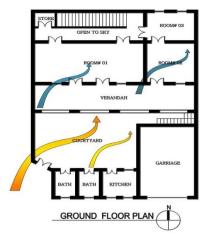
Plans of various detached houses at Hirabad, Hyderabad.
